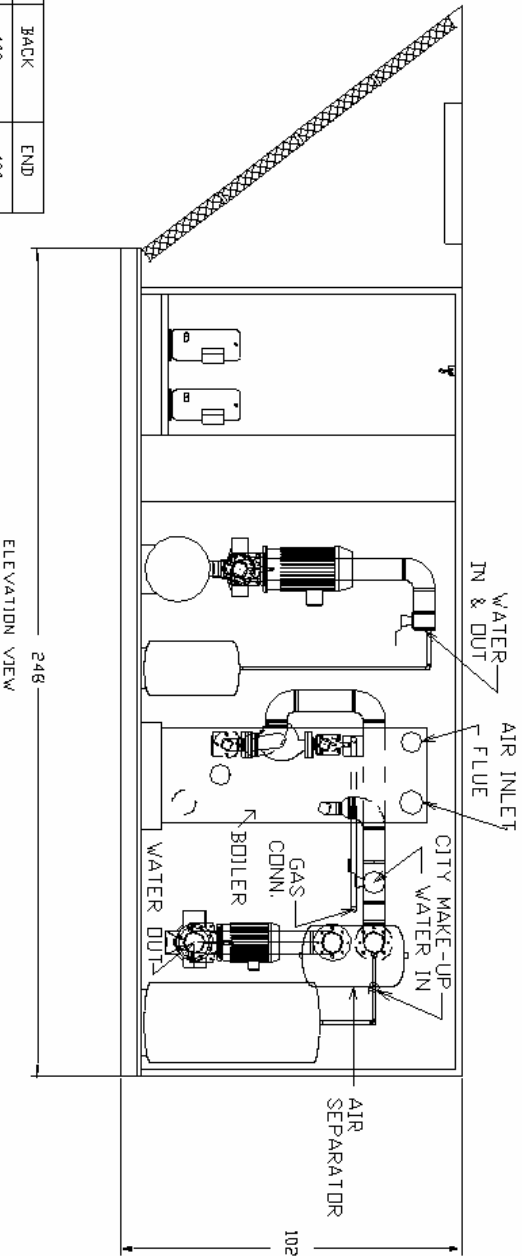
LL-035 with an Air-Cooled Condenser, Single Chiller Building Pump, One Boiler and Single Boiler Building Pump
